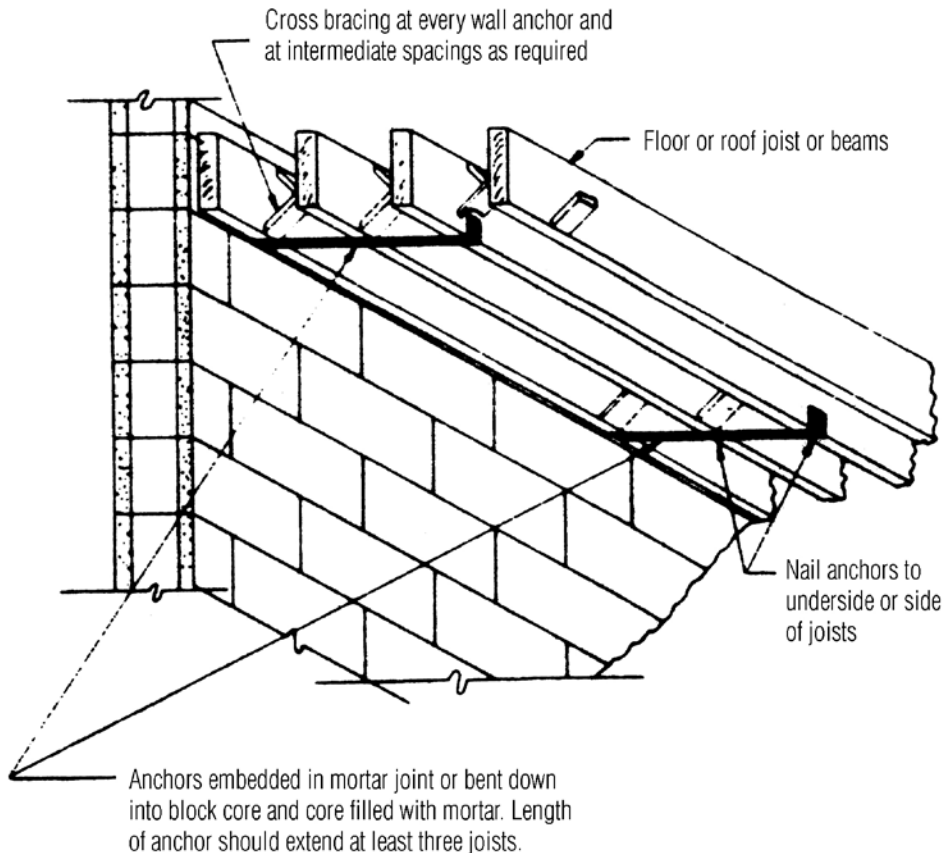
FIGURE L: TYING BLOCK TO FLOOR FRAMING
